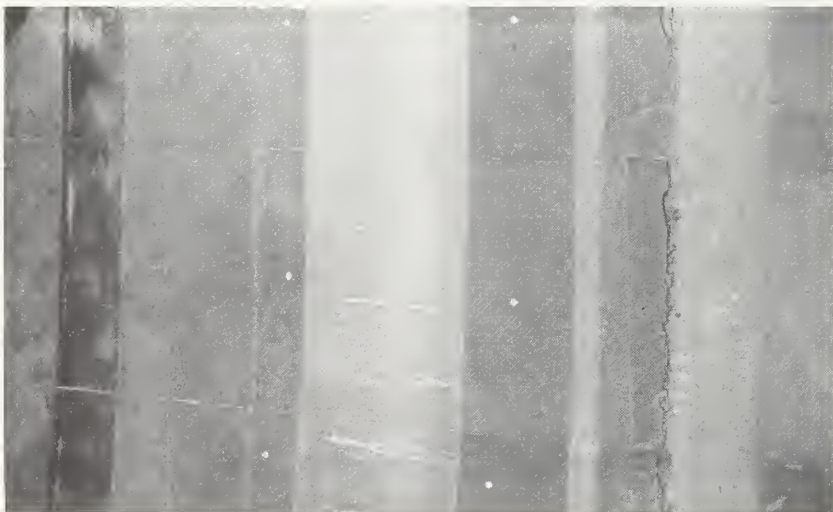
$\frac{1}{8}$ -in. asphalt tile on wood subfloor (test panel 20R).
